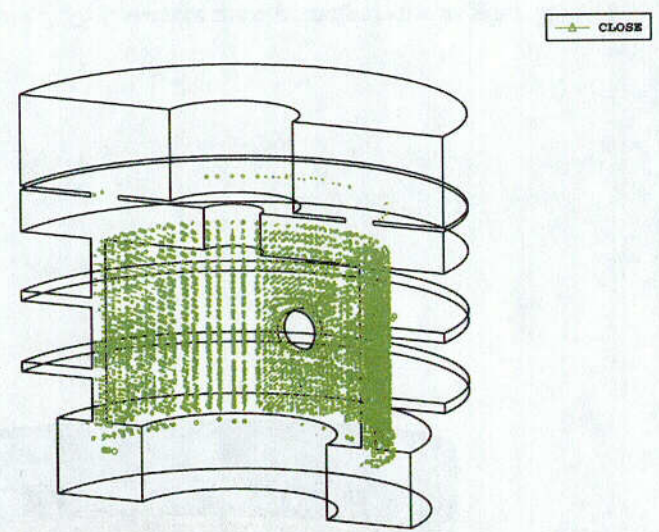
Close crack surfaces in RCCV after 2S2(H)
